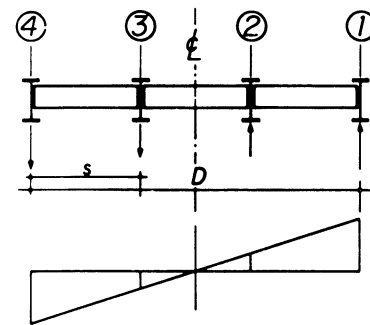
Cross-section of a four-girder bridge and assumed distribution of diaphragm shears to girders
